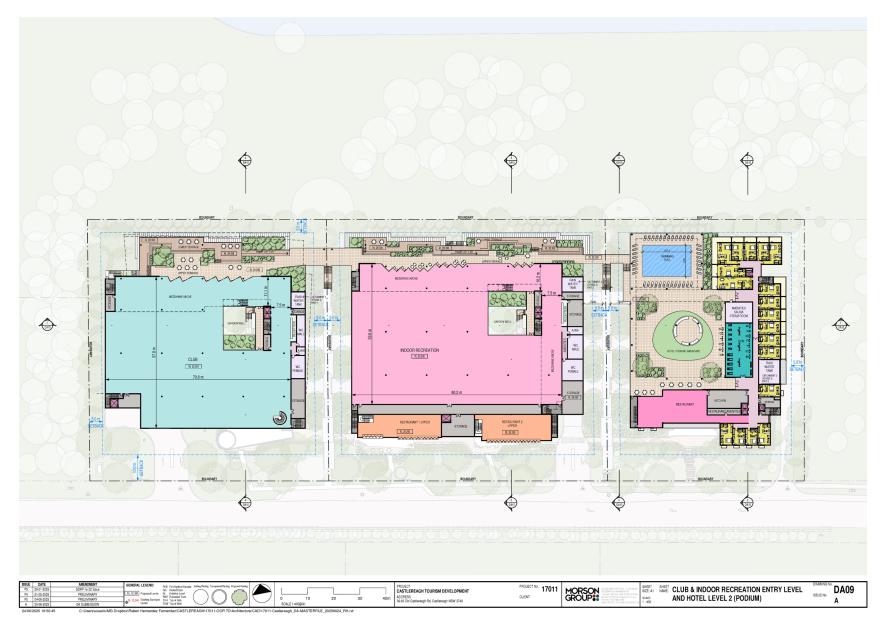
Floor Plan of Club and Indoor Recreation Level 1 and Hotel Level 2
